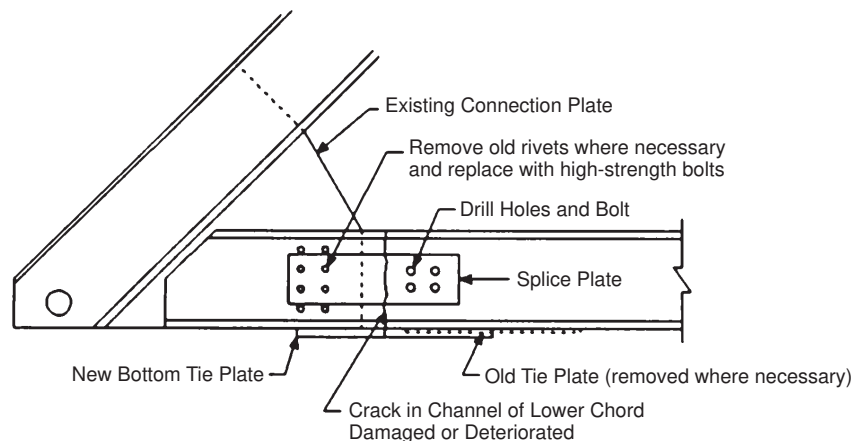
Typical Truss Repair Where Complete Removal Is Not Necessary
